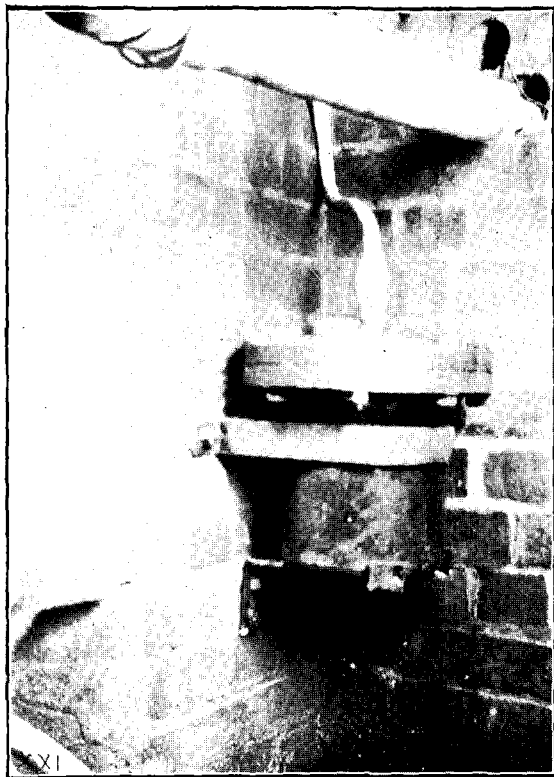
Showing Pot Fixed on Bracket, and Clipped to Wall in Manhole.
